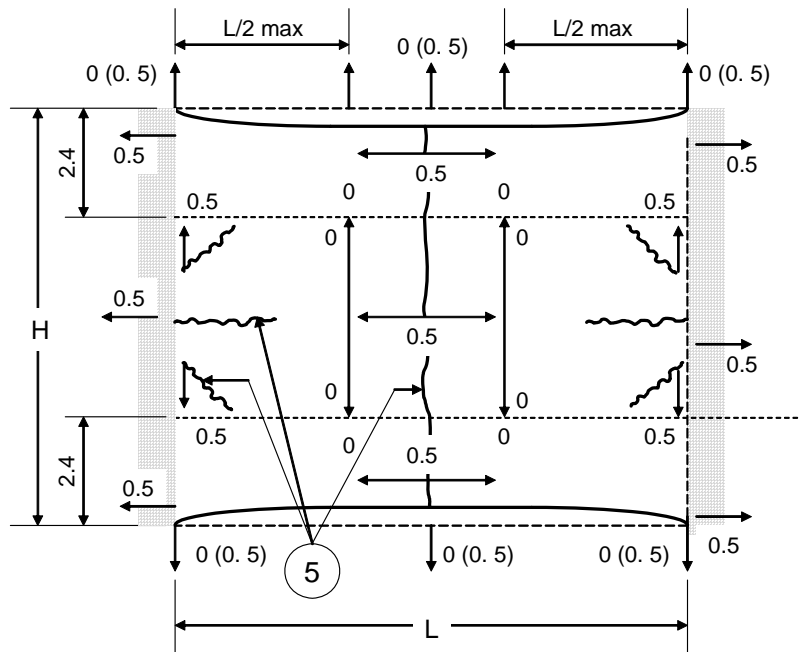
Early thermal cracking in the walls of a box-section tunnel wall
